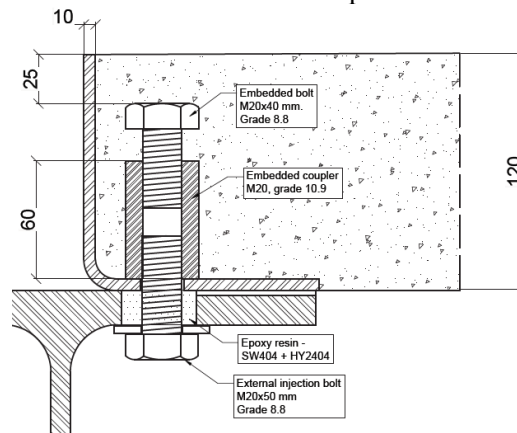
Resin injected bolt coupler connector in prefabricated concrete solid deck (6)
